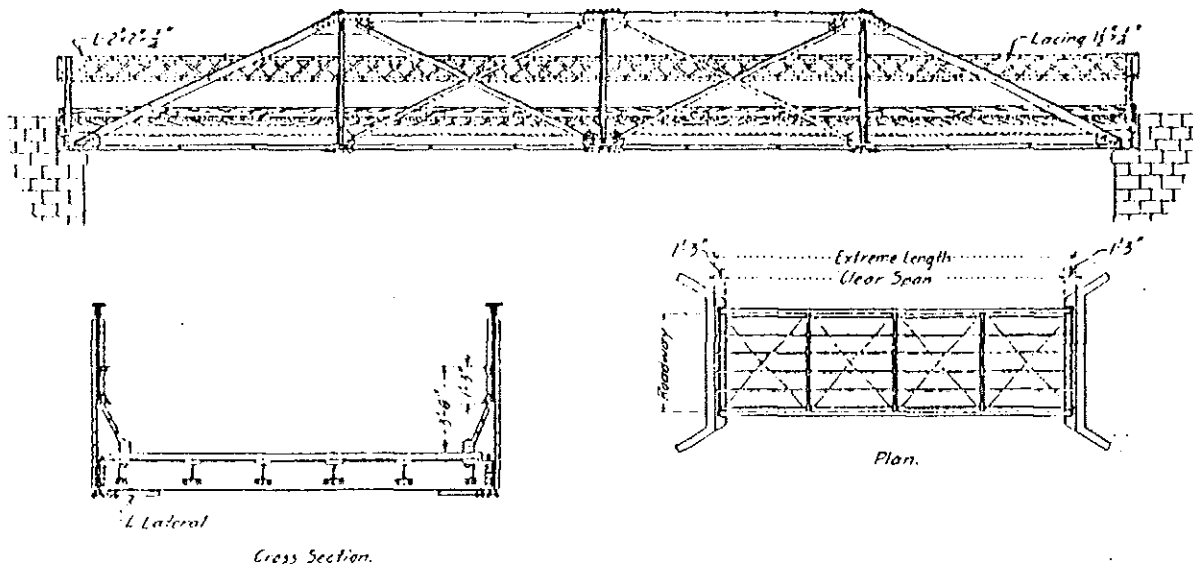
The American Bridge Company's 1912 design for a wrought iron, Pratt pony truss highway bridge similar to the Mitchell's Mill Bridge. From Ketchum, *Design*, p. 201.
